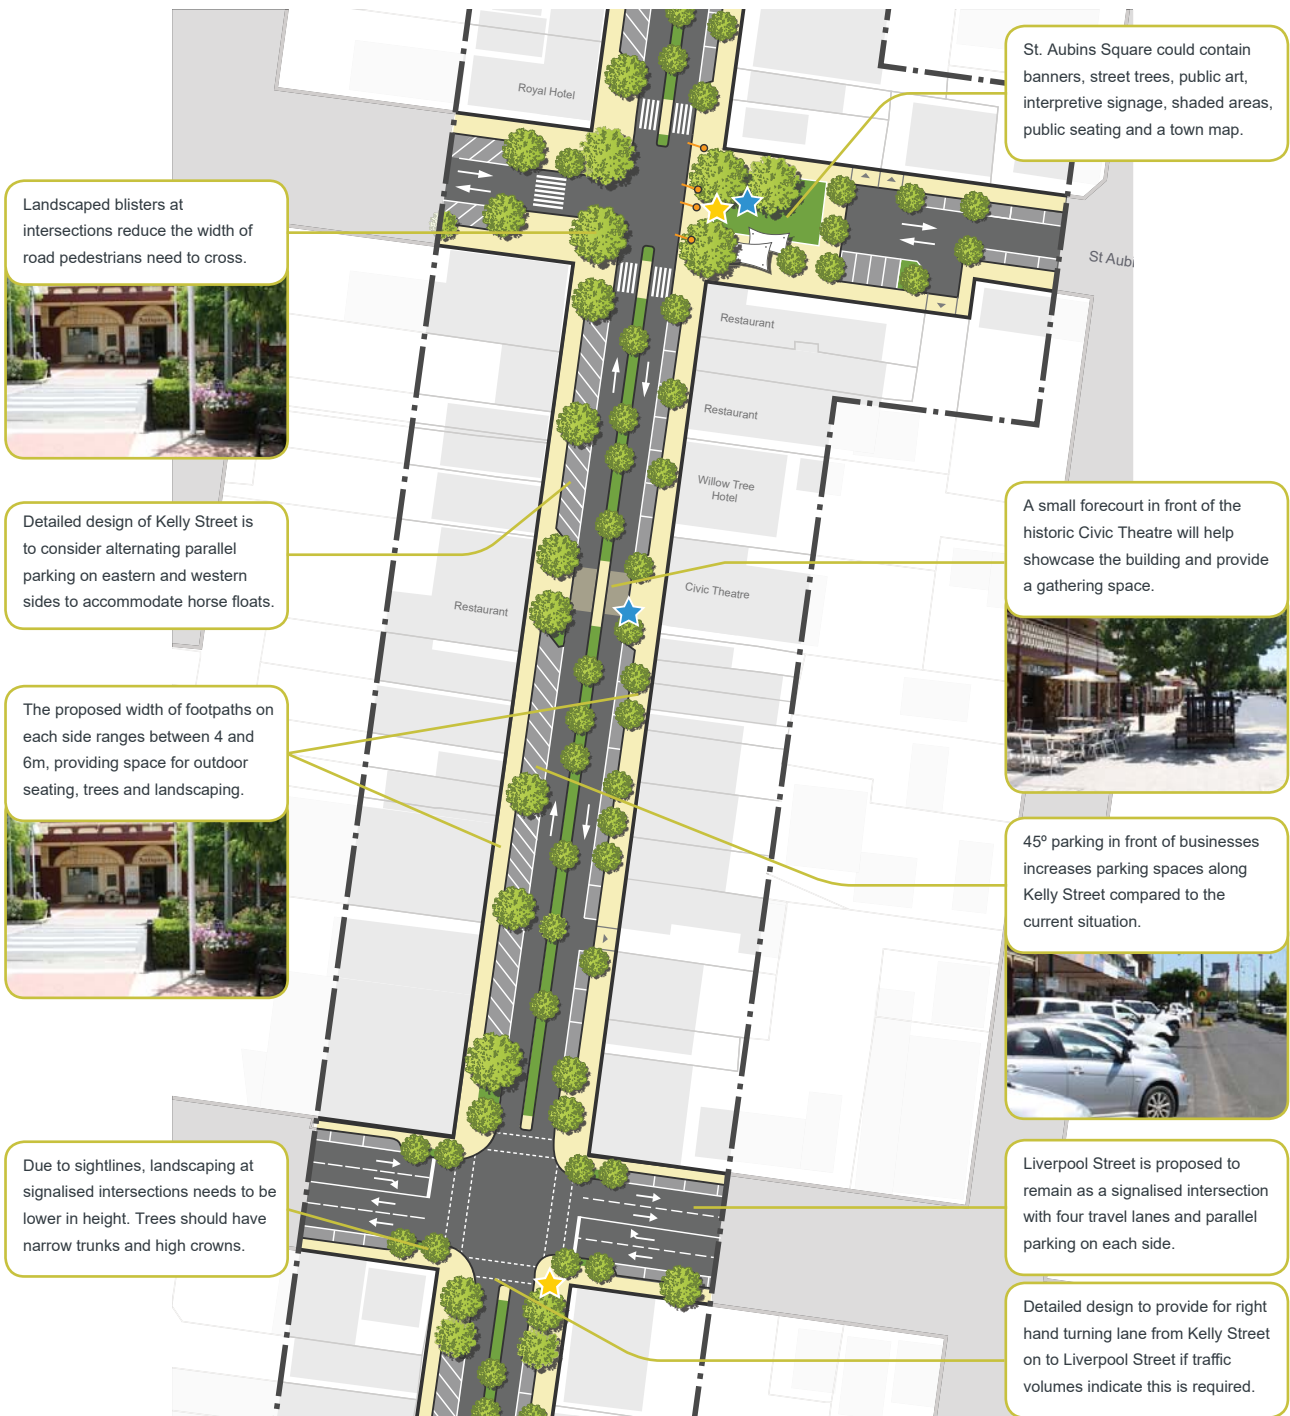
Kelly Street section with suggested configuration (northern section). Not to scale.
